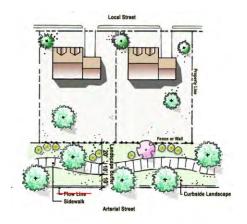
Arterial Street Frontage Buffer Measurement Detached Meandering Walk
